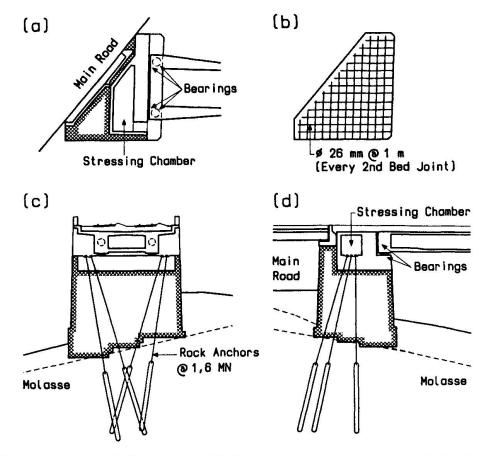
West abutment: (a) Plan view; (b) Orthogonal reinforcement in bed-joints; (c) Crosssection; (d) Elevation.
